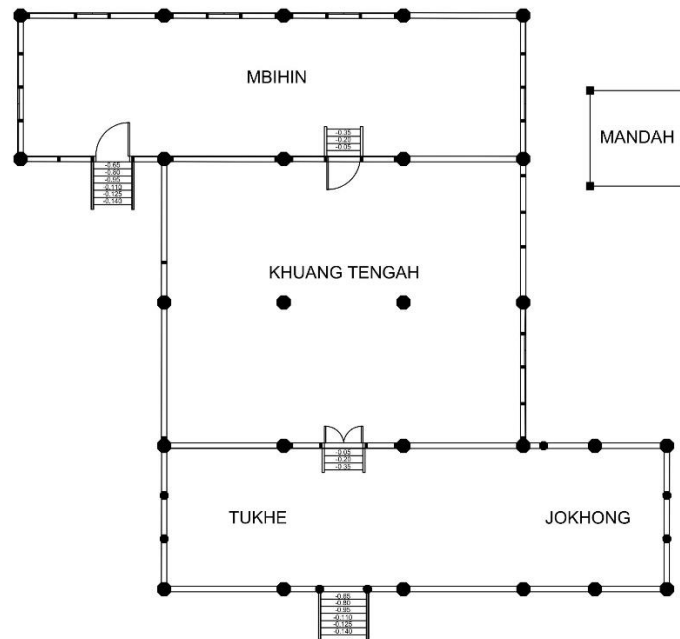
Sapo Belen Sinanggal floor plan. Vohry, (2013).
